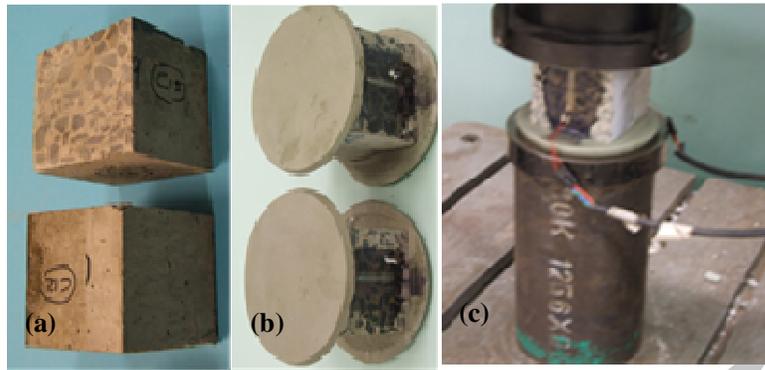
(a) concrete cubes, (b) prepared specimens for testing, (c) test set-up
